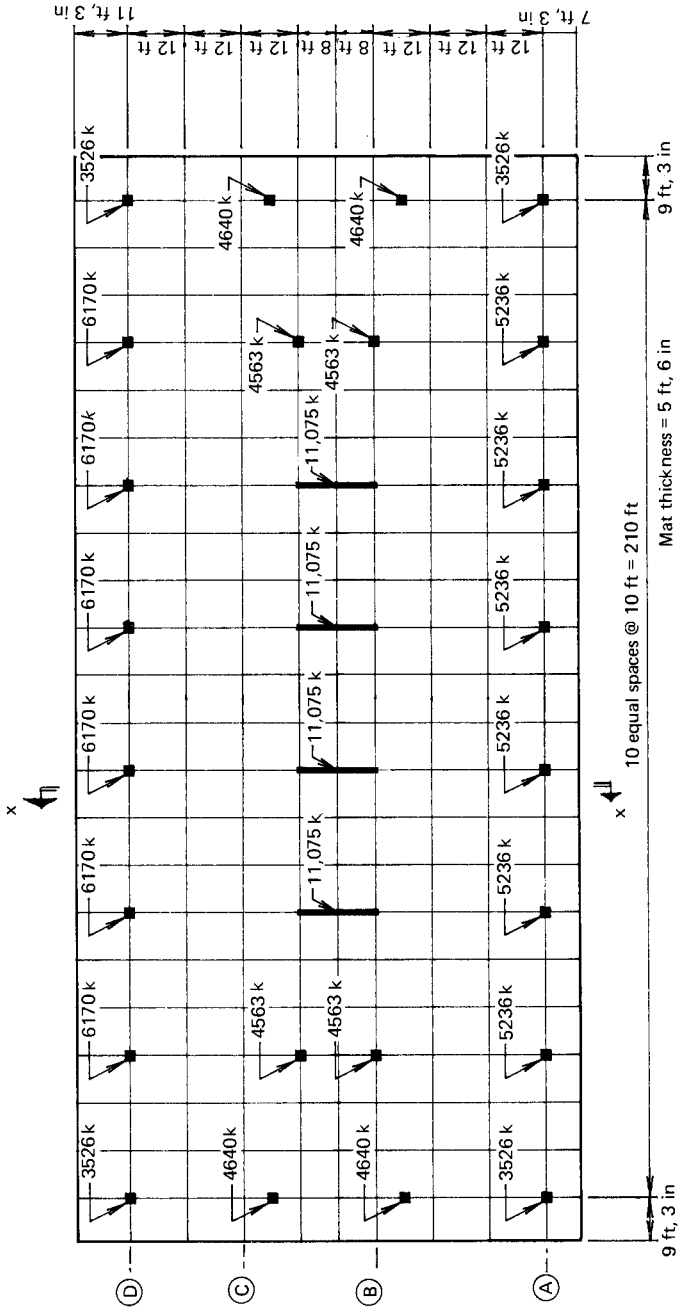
Foundation mat for a 25-story building: finite element idealization and column ultimate loads.
